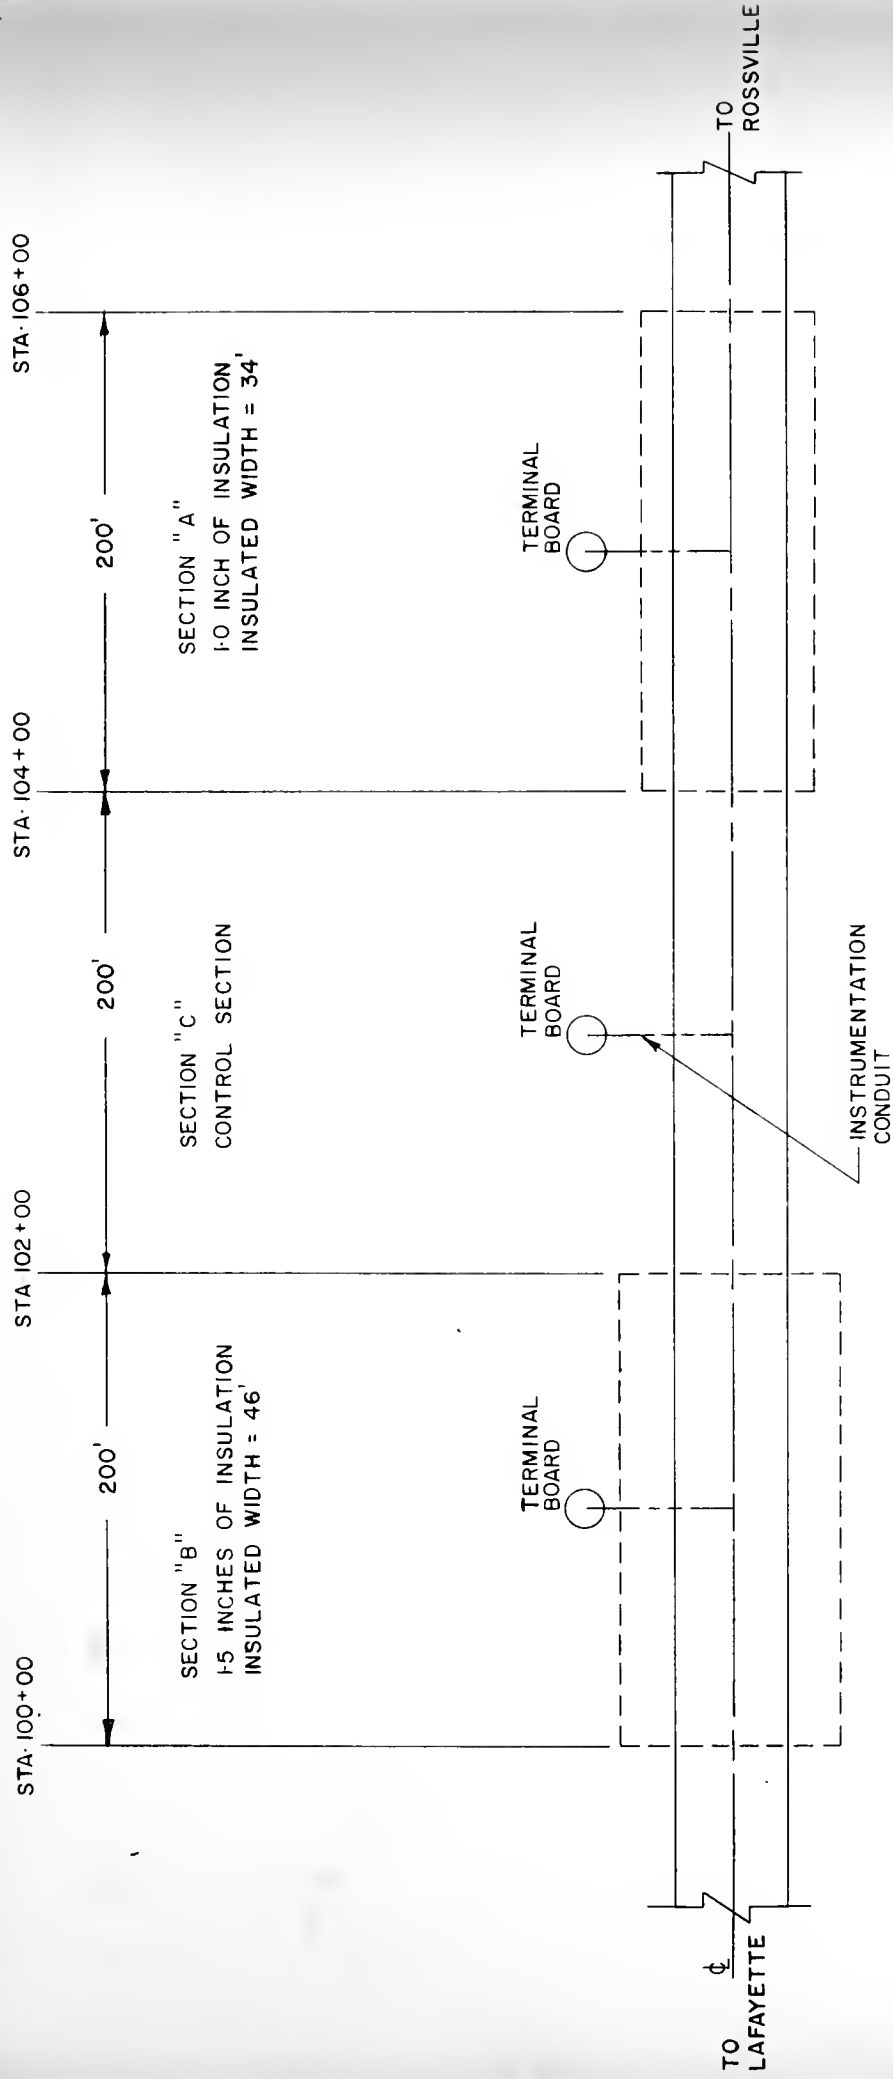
PLAN OF FIELD TEST INSTALLATION
